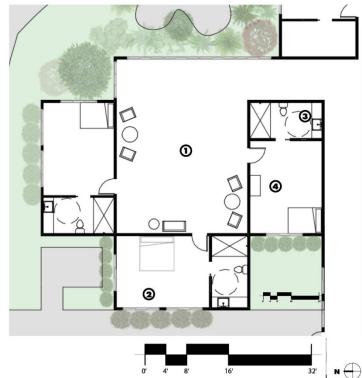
Main Level Floor Plan: Private Residential Rooms
